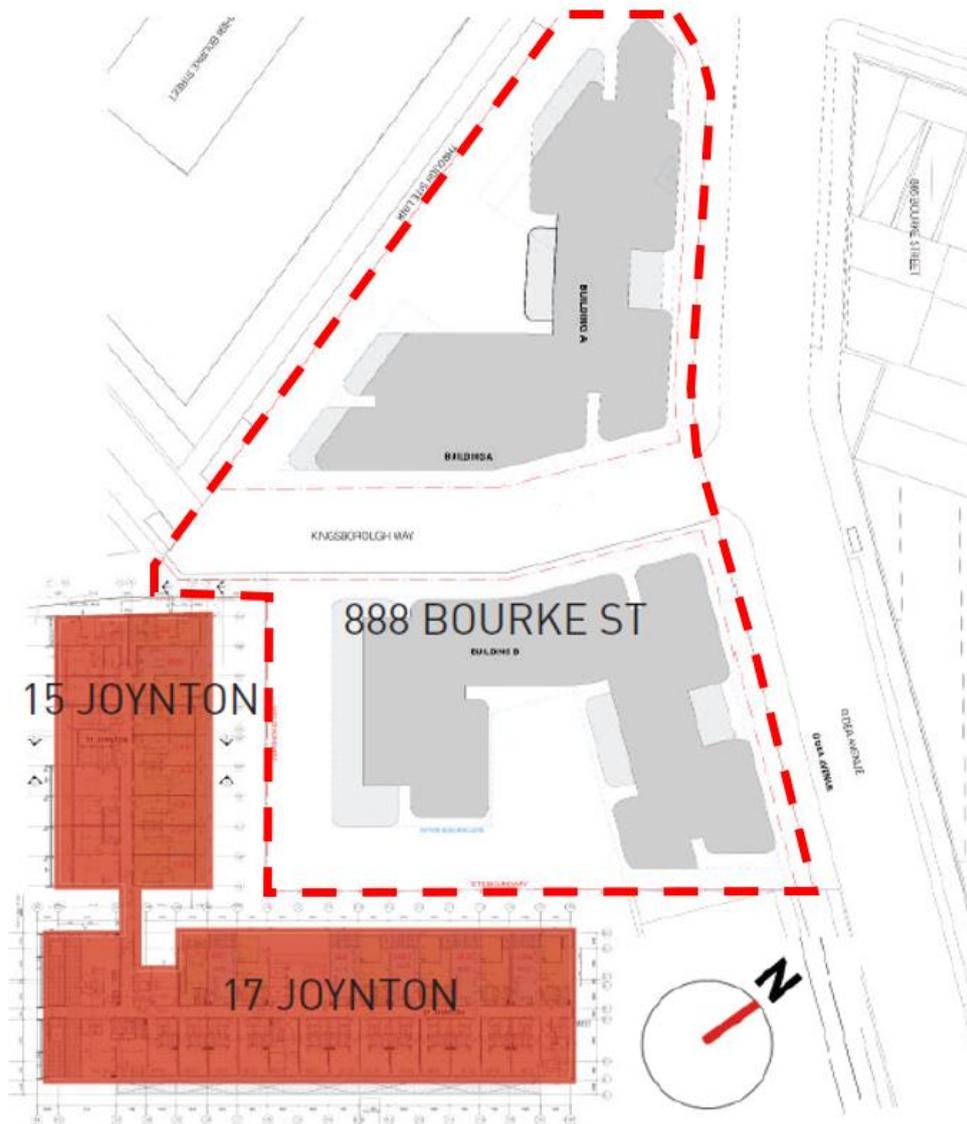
Site plan of subject site (with proposed buildings) and affected residential buildings – 15 and 17 Joynton Avenue
